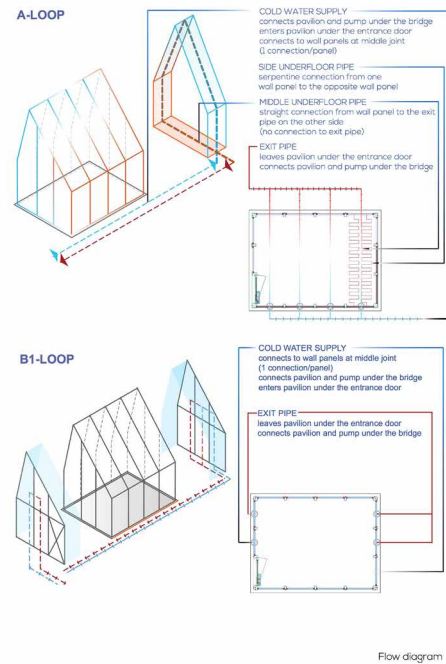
Water House 2.0 – Diagram of water flow, arranged in loops
